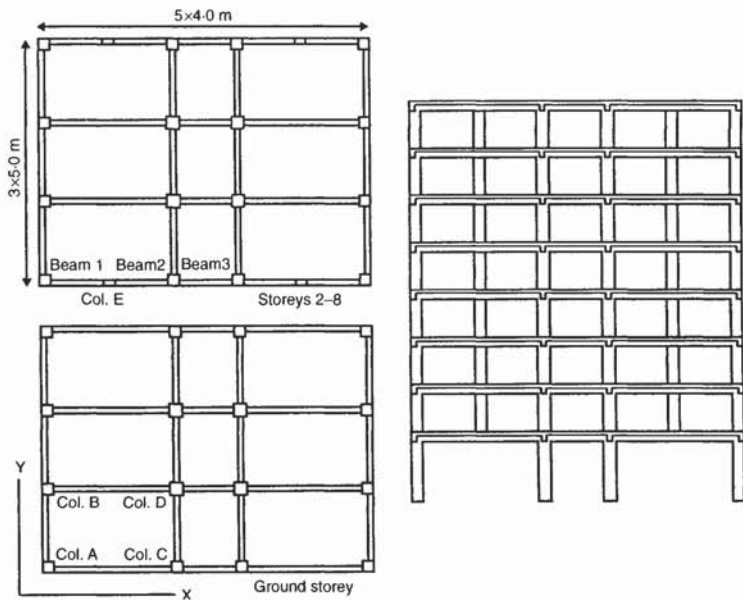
Plan and elevation of 8-storey irregular frame structure
